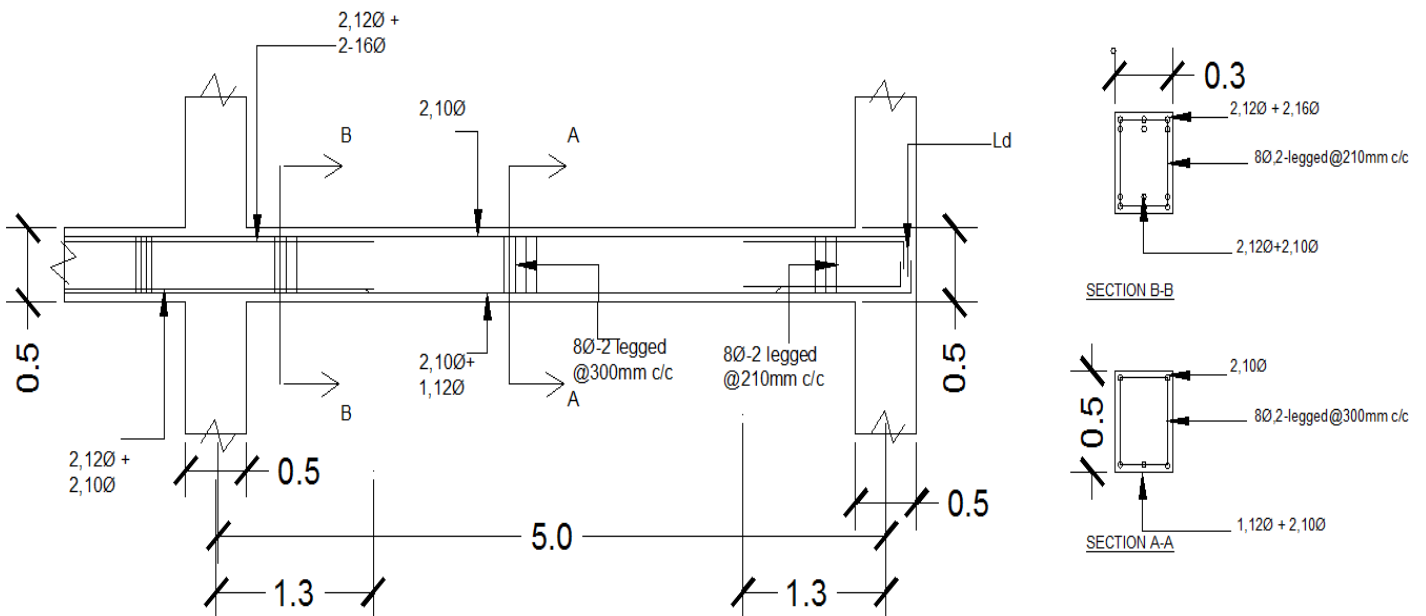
reinforcement detailing for an interior beam of G4ZII
